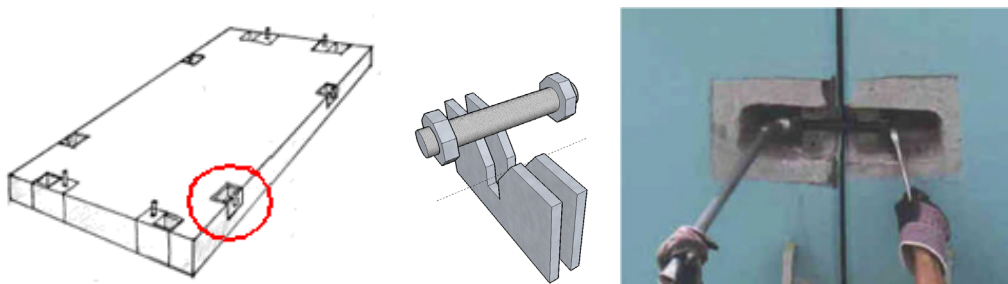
Floor-to-floor connection for concrete elements, Consolis (2007).
